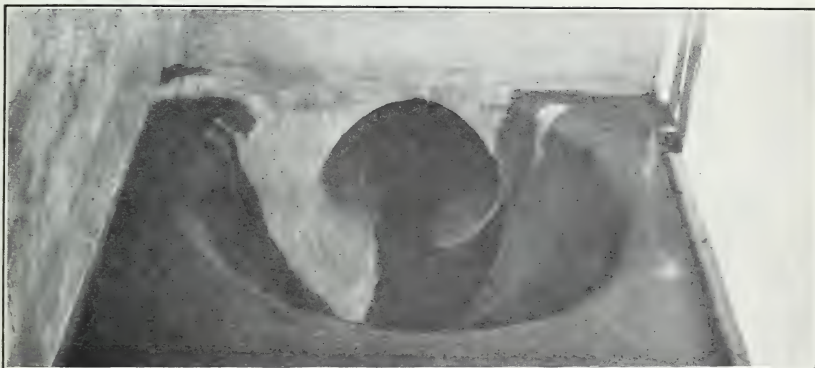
SIPHON INLET MADE FROM FORM SHOWN IN FIGURES 1 AND 2. ENTRANCE WELL SUBMERGED, PREVENTING AIR BEING CARRIED INTO PIPE.
